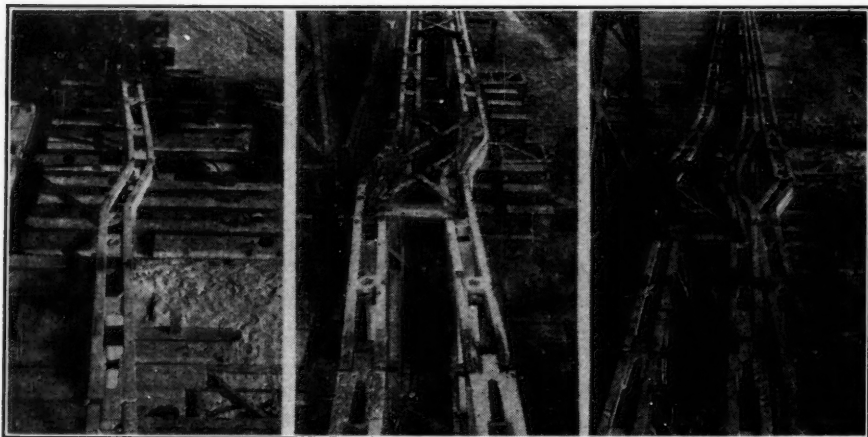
TOP CHORD FAILURES OF SINGLE TRUSS, DOUBLE TRUSS, AND TRIPLE TRUSS BAILEY BRIDGES
